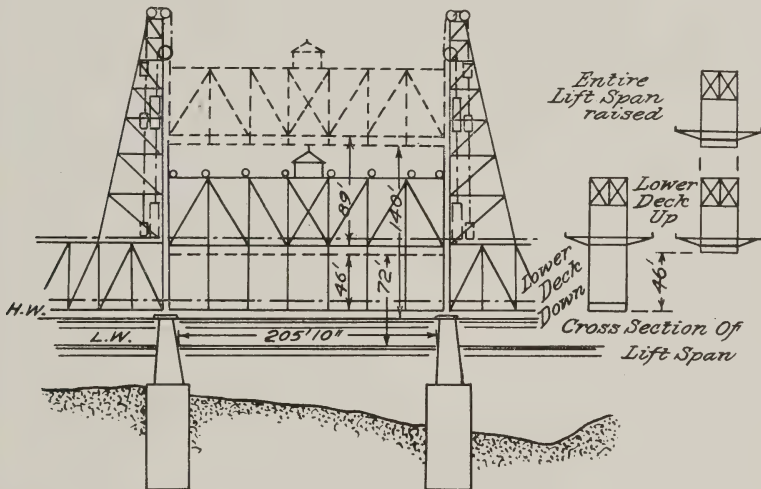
Vertical Lift Bridge of the Oregon Railroad and Navigation Company, over the Willamette River at Portland, Oreg. The lower deck provides for a double-track railway in a roadway 32 feet 8 inches in the clear. The upper deck provides for a double-track street railway in a roadway 29 feet 3 inches in the clear between trusses, vehicular traffic on two cantilevered roadways 11 feet in the clear and pedestrian traffic on two sidewalks 6 feet in the clear, making 72 feet 9 inches between outside hand rails. The lower deck in the channel span is raised to accommodate river traffic; and to permit the passage of high-masted sailing vessels, the lower deck telescopes with the upper deck and then both are raised to a clear height of 140 feet above high water. The total weight of the lifting span and deck is 4,300,000 pounds. A 12-inch gas main is carried across on the lift span, remaining in continuous service during the movement of the span. The span is operated by direct electric current from street railway mains. The lower lifting deck is raised to its full height or lowered in 30 seconds, and both decks are then raised to their full height or lowered in 60 seconds. The lifting span and lifting deck are fully and independently counterweighted. Waddell & Harrington, Consulting Engineers.
